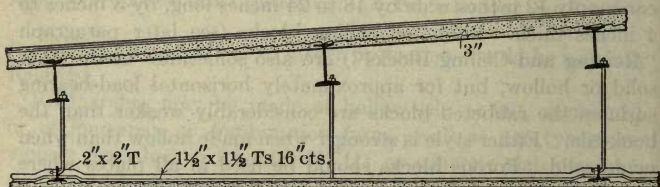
Roof with Suspended Ceiling, U. S. Appraisers' Warehouse, N. Y.
